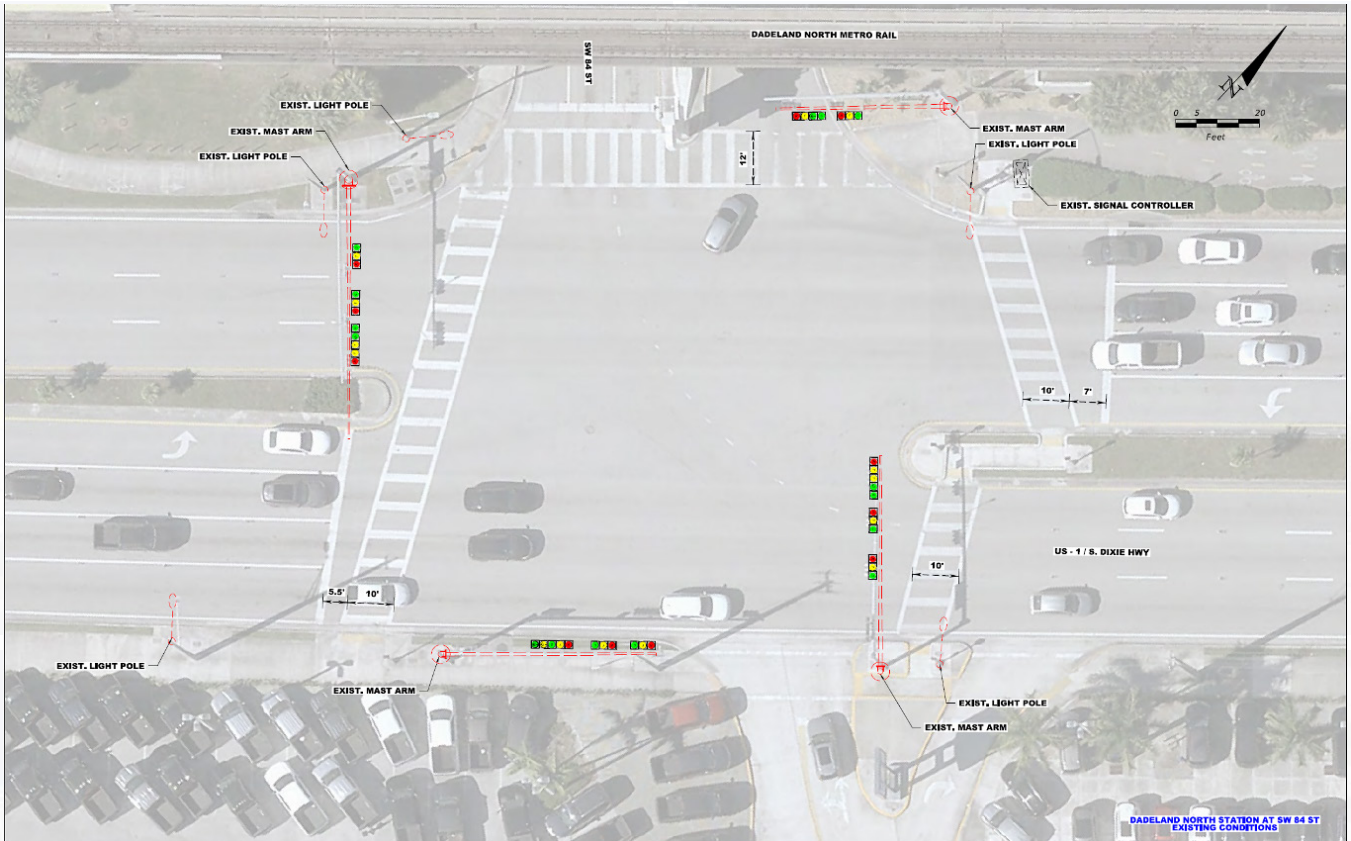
Dadeland North Metrorail Station Intersection at US-1 and SW 84 Street Existing Conditions
